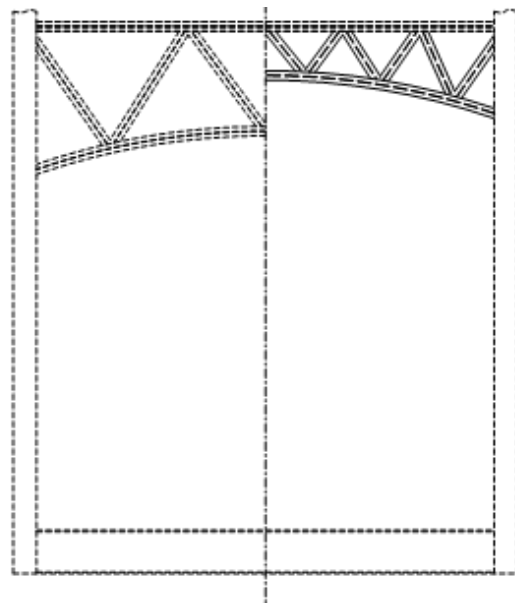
Before and After View of Portal Bracing Reconstruction, “W” Bracing Arrangement.
